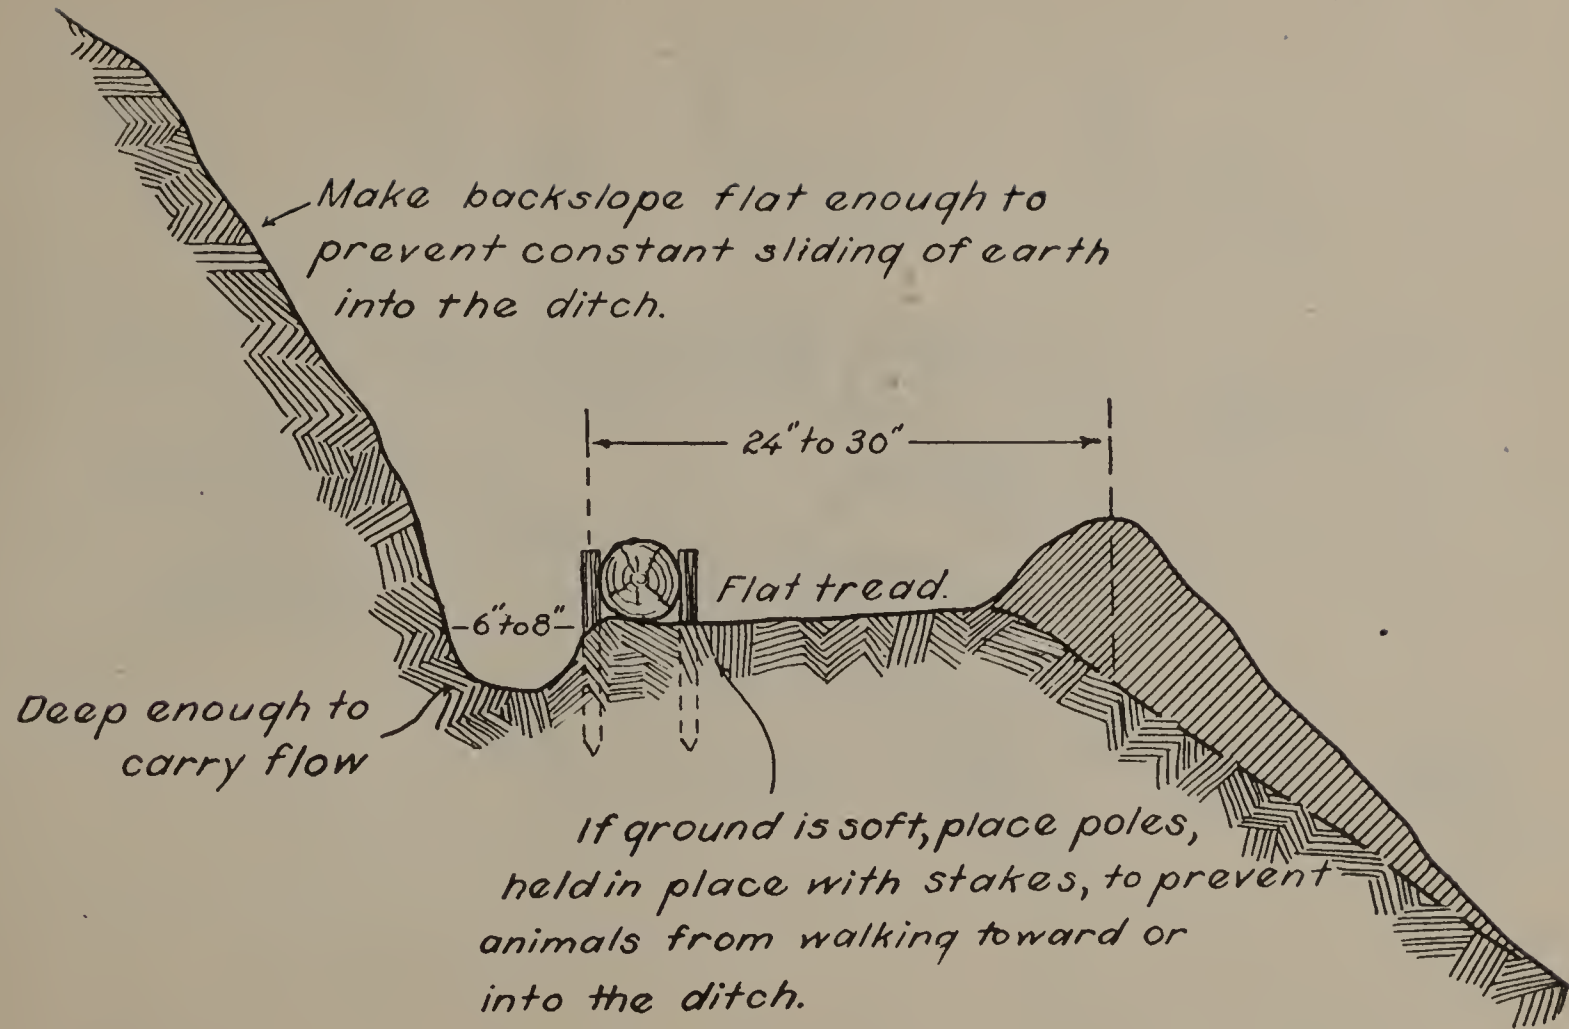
Cross section of a trail provided with a ditch against the back to drain seepage from springs above the trail. (Par. 79.)
